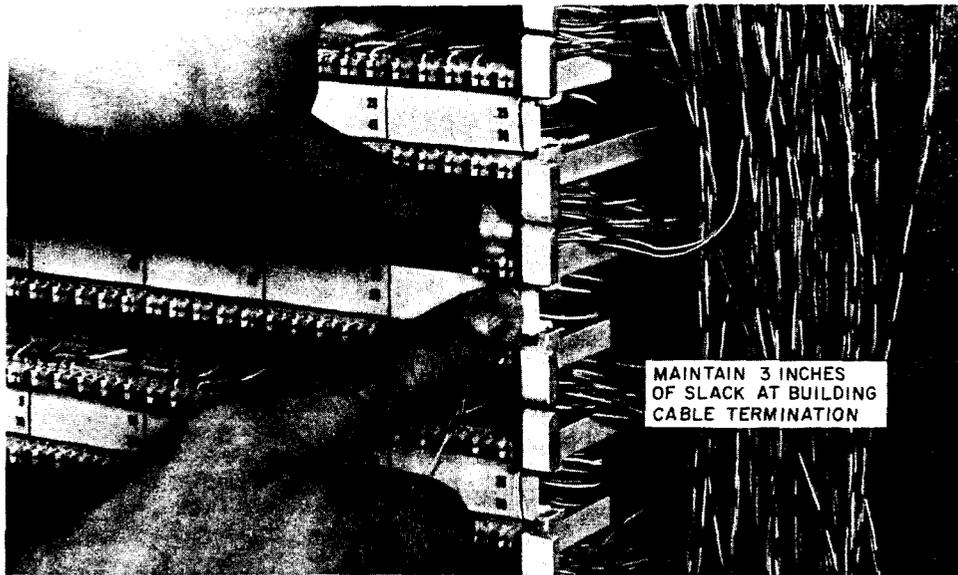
Positioning F Cross-Connecting Wire to Assigned Building Cable Pair
